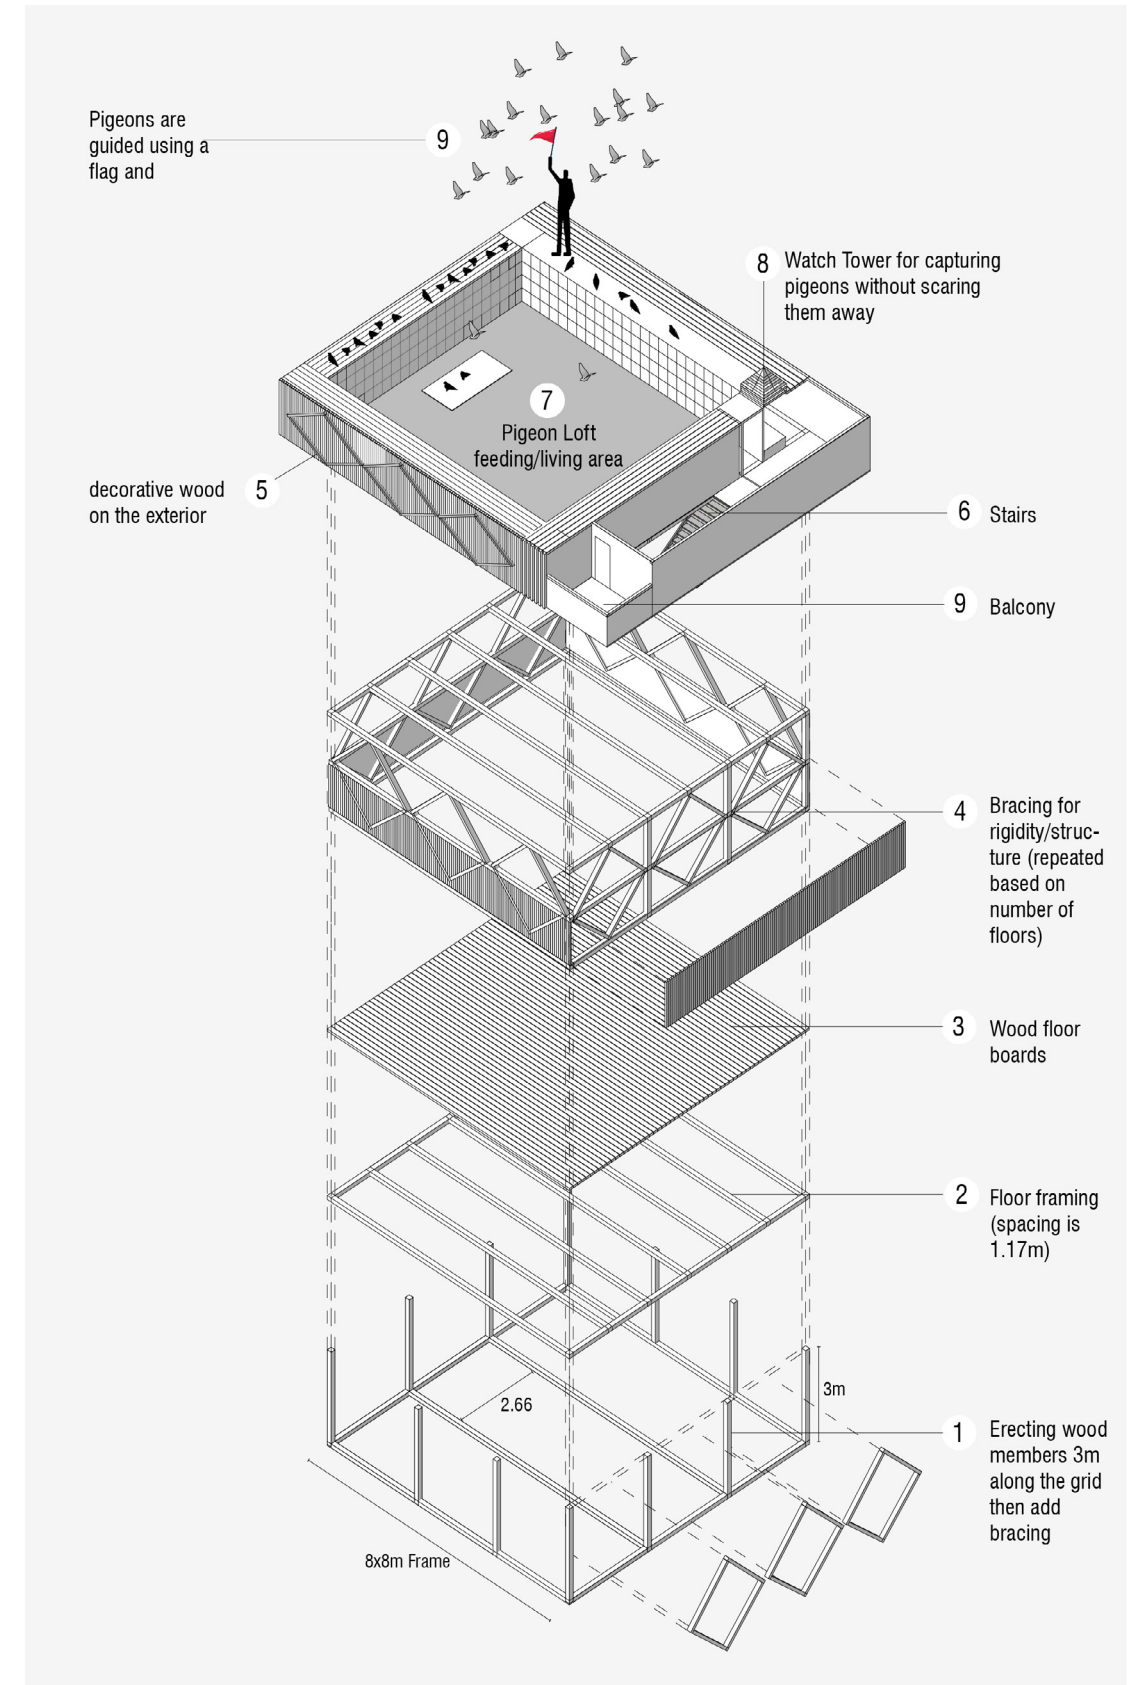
Exploded axonometric drawing showing Pigeon tower construction process. Drawn by author
